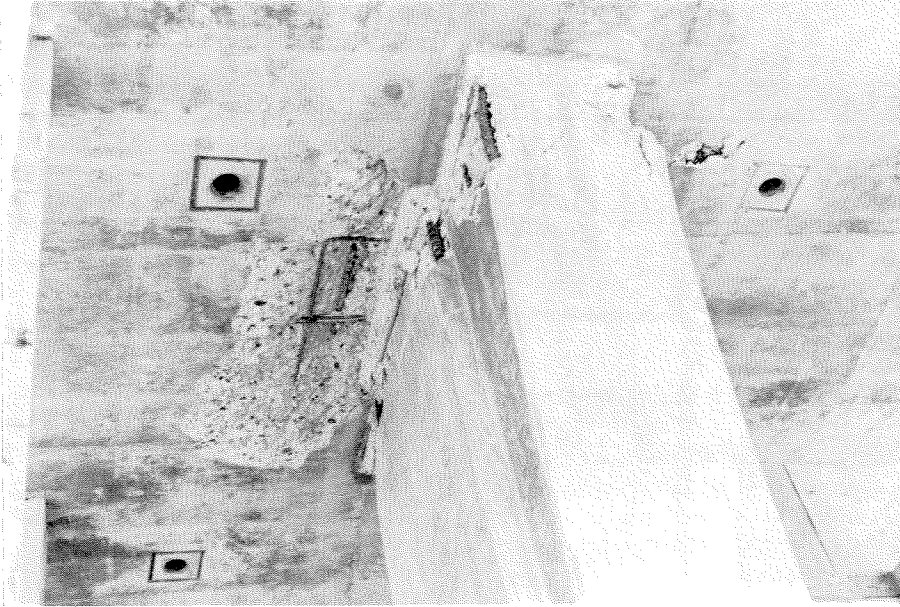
Column damage at the Bledsoe Street overpass, Foothill freeway.
